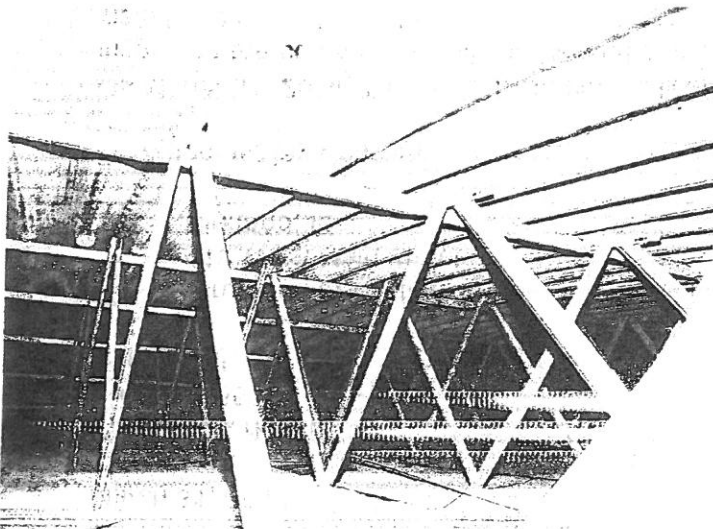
Steel Truss Work Forming and Supporting Roof and Ceiling.
